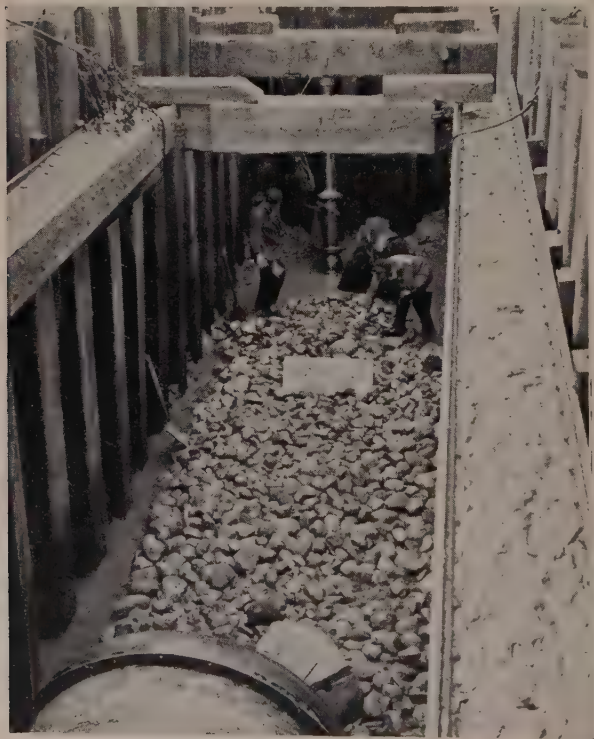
RUBBLE BLANKET OVER BAD BOTTOM IN BEACH SECTION
